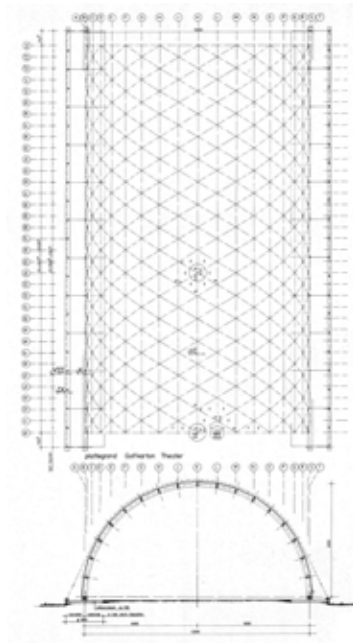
Plan and section of Apeldoorn Cardboard Theatre, 1992
